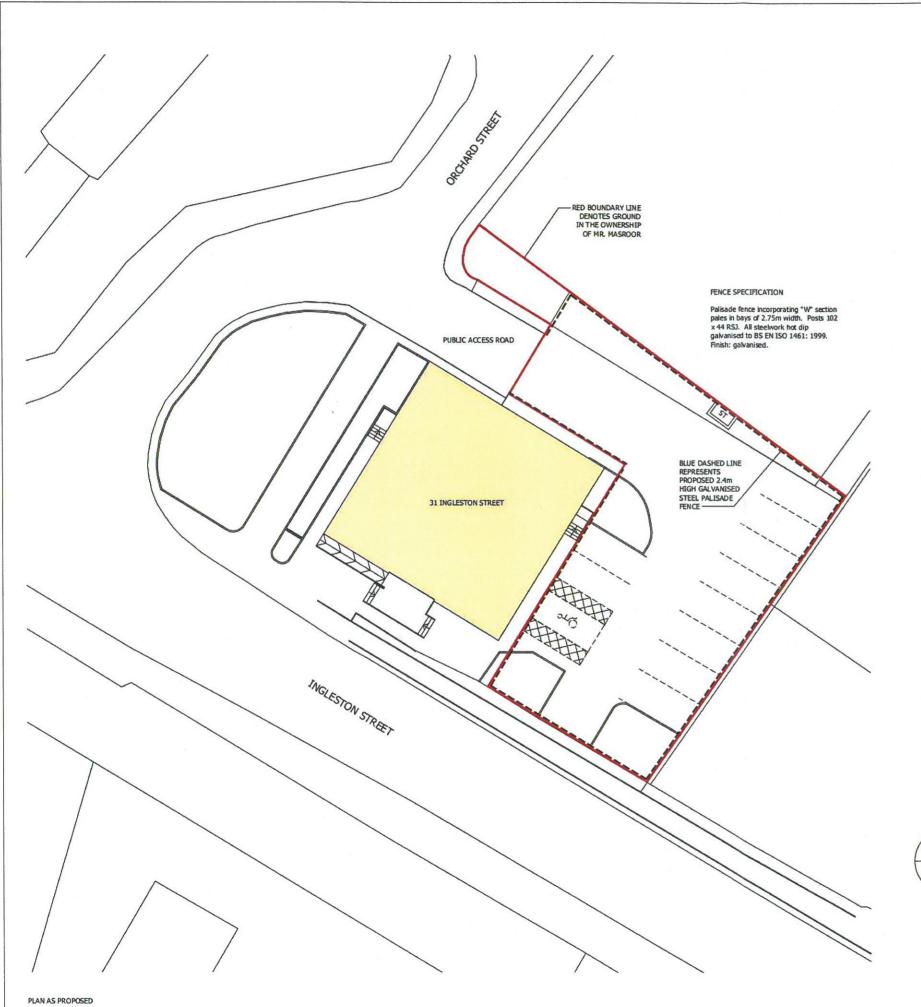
IMAGE SHOWING TYPICAL FENCE ARRANGEMENT
